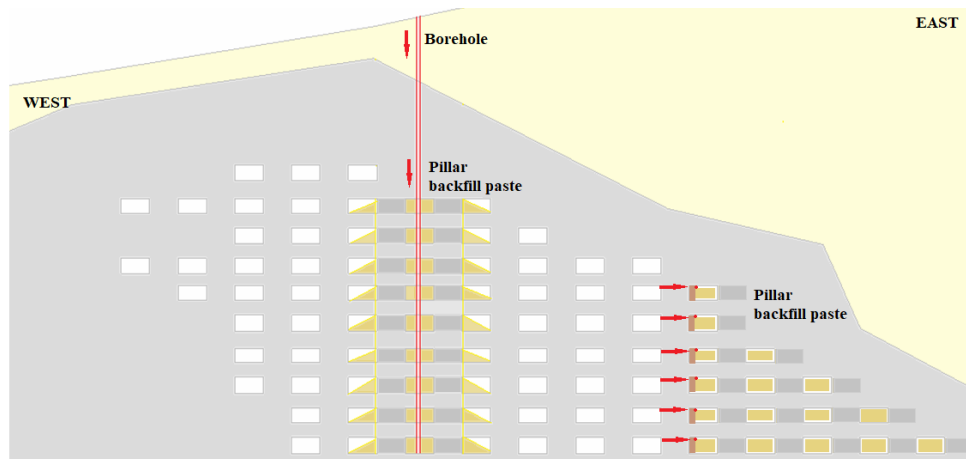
Vertical section through the Cantacuzino mine, with the introduction of the backfill paste from the surface through vertical boreholes and underground mining workings [6]
